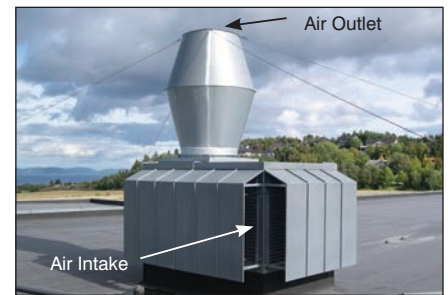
Shielded fresh air ventilation intakes on university building roof. Vertical side intakes and horizontal top outlet.
